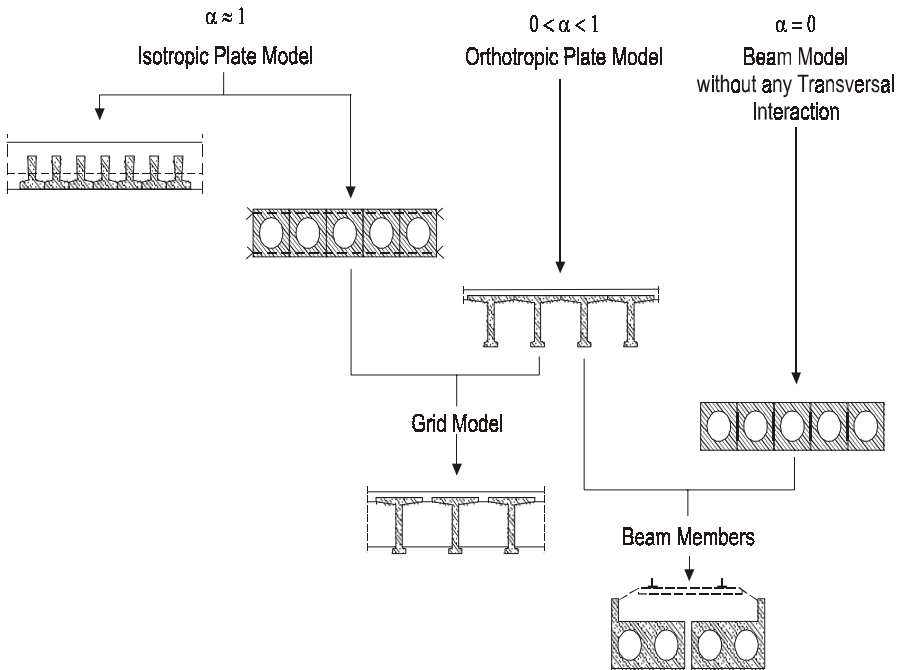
Calculation models for precast and composite concrete bridge superstructures.^{5,6}
